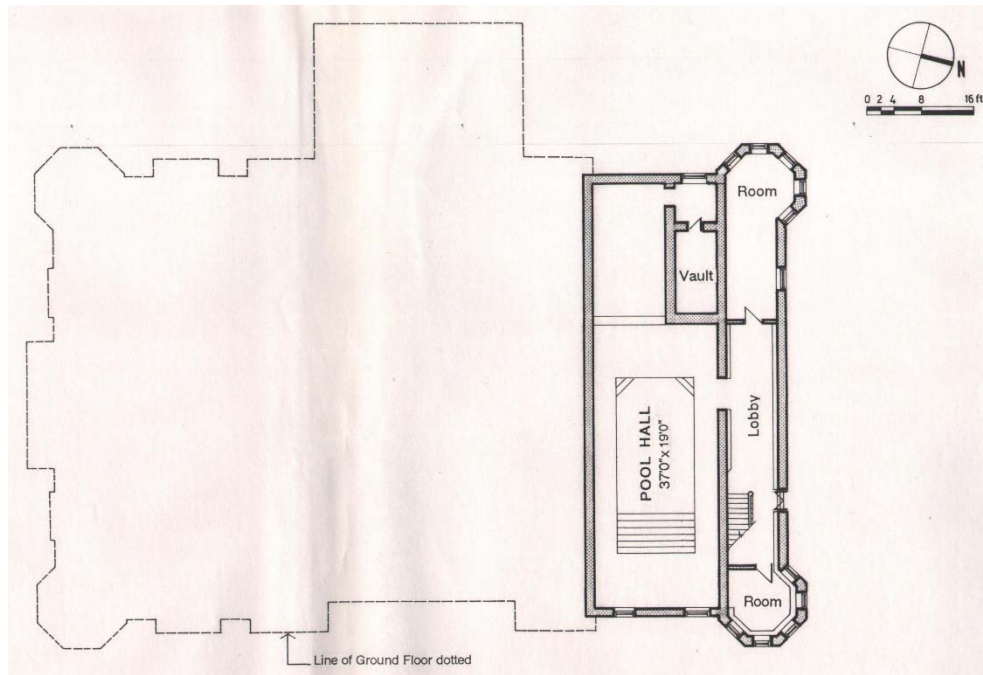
Basement's Plan of Mohatta Palace. Courtesy to Copyright © 2016 Heritage Foundation of Pakistan.
